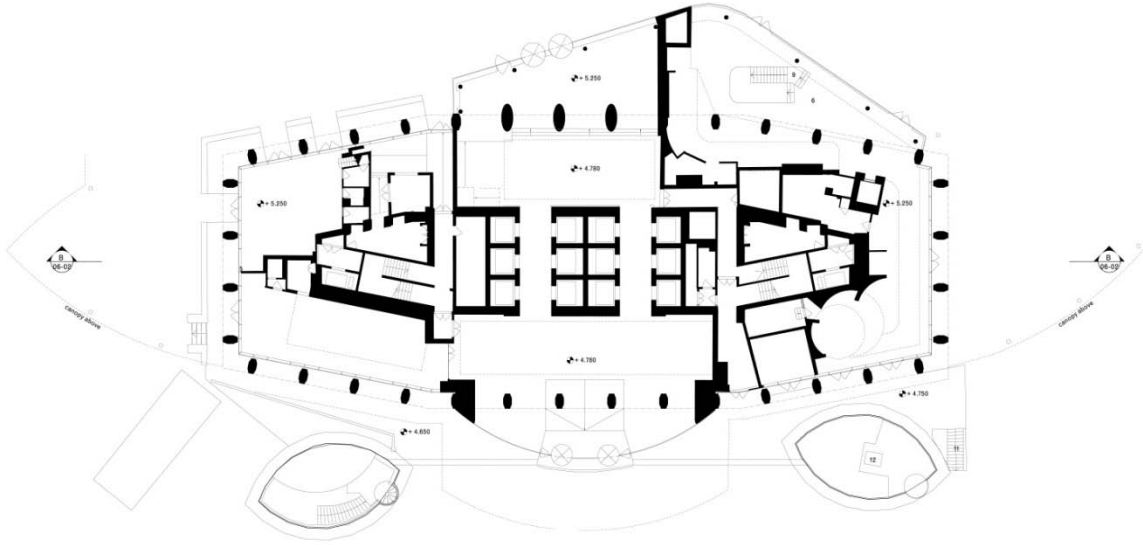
Portland House, Ground Floor Plan, Existing (DCA, 2013)
